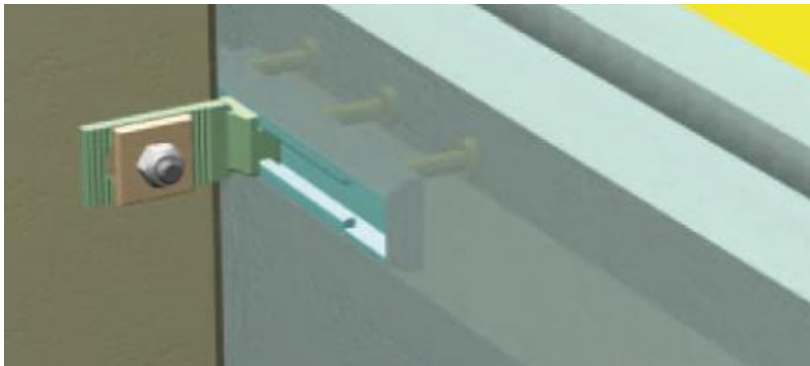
Horizontal panels placed on the ground FO/20 (Ruredil. Construction chemicals and building technologies. “Fisis Earthquake-proof system for fixing panels”)
